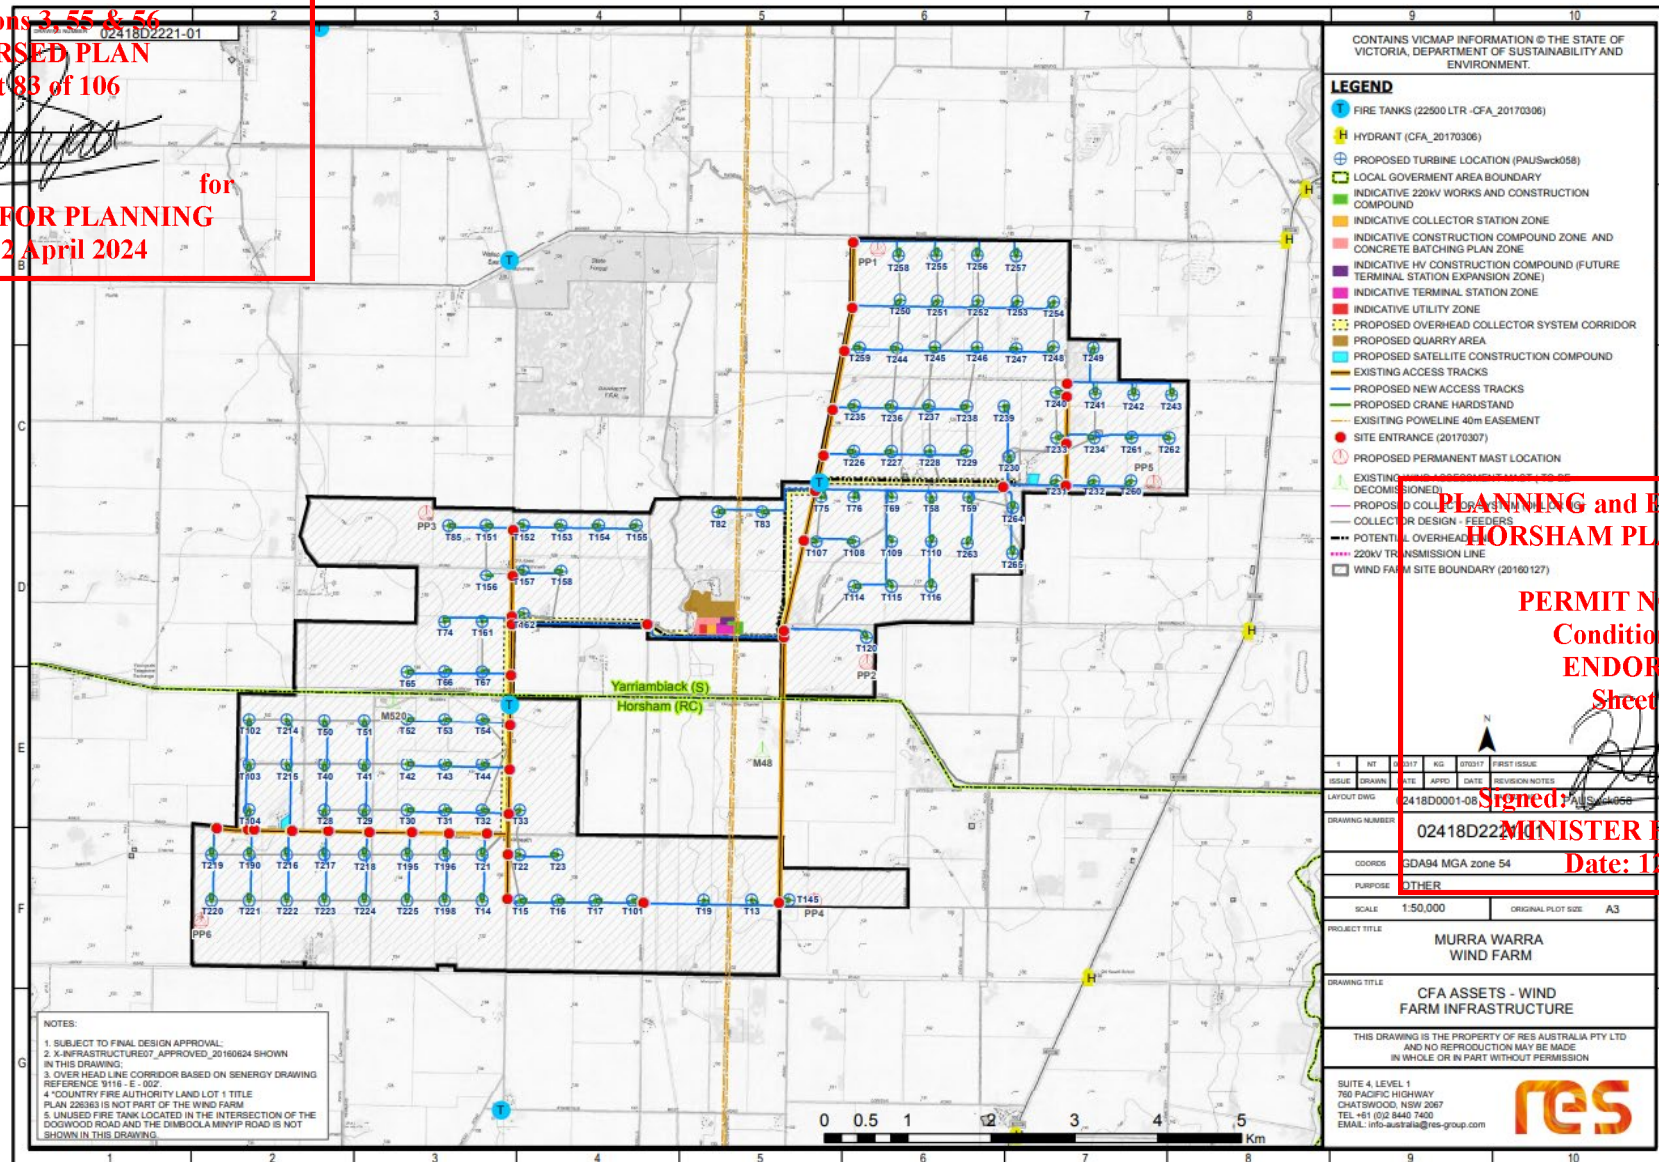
MW2 SITE LAYOUT PLAN WITH EMERGENCY ASSEMBLY POINT (DOWNER, 2017)
